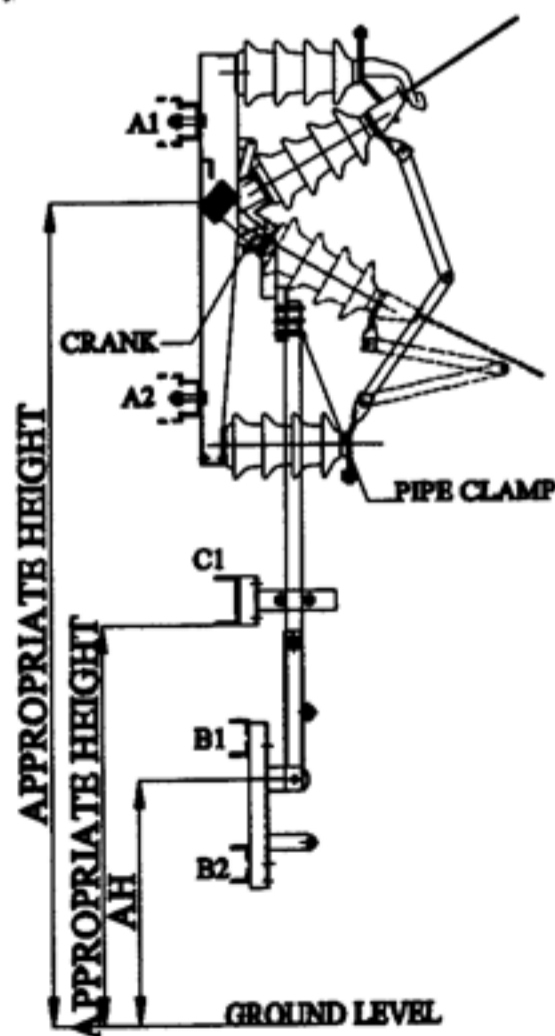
# DETAILED INSTRUCTION FOR MOUNTING / INSTALLATION OF THE AIR BREAK SWITCH - HORIZONTAL/VERTICAL TYPE
